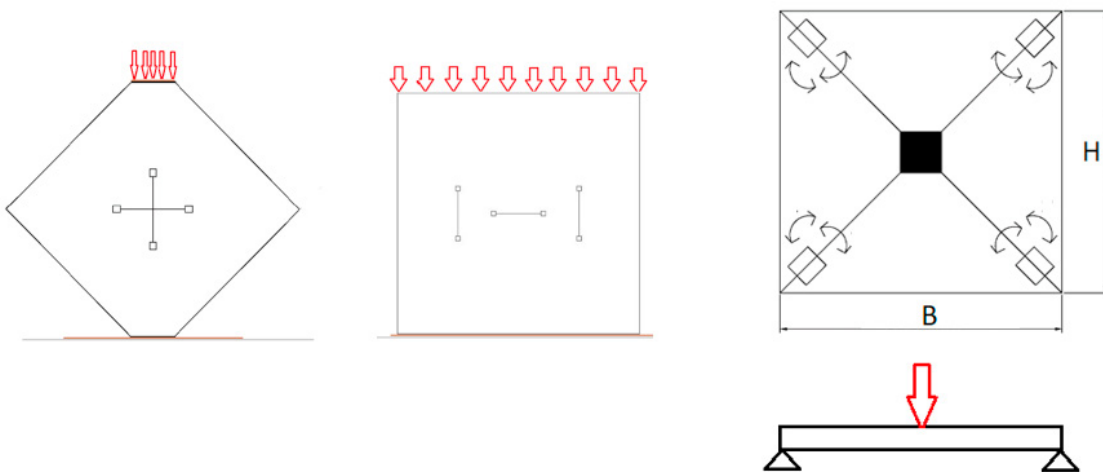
Specimen tested, all specimens had the same dimensions (1mx1m).
